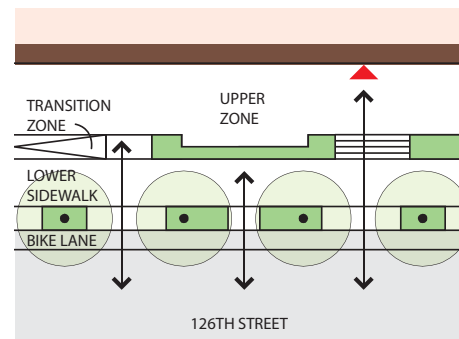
Diagram of access points between the roadway, Lower Sidewalk, Upper Zone and storefront entries.
